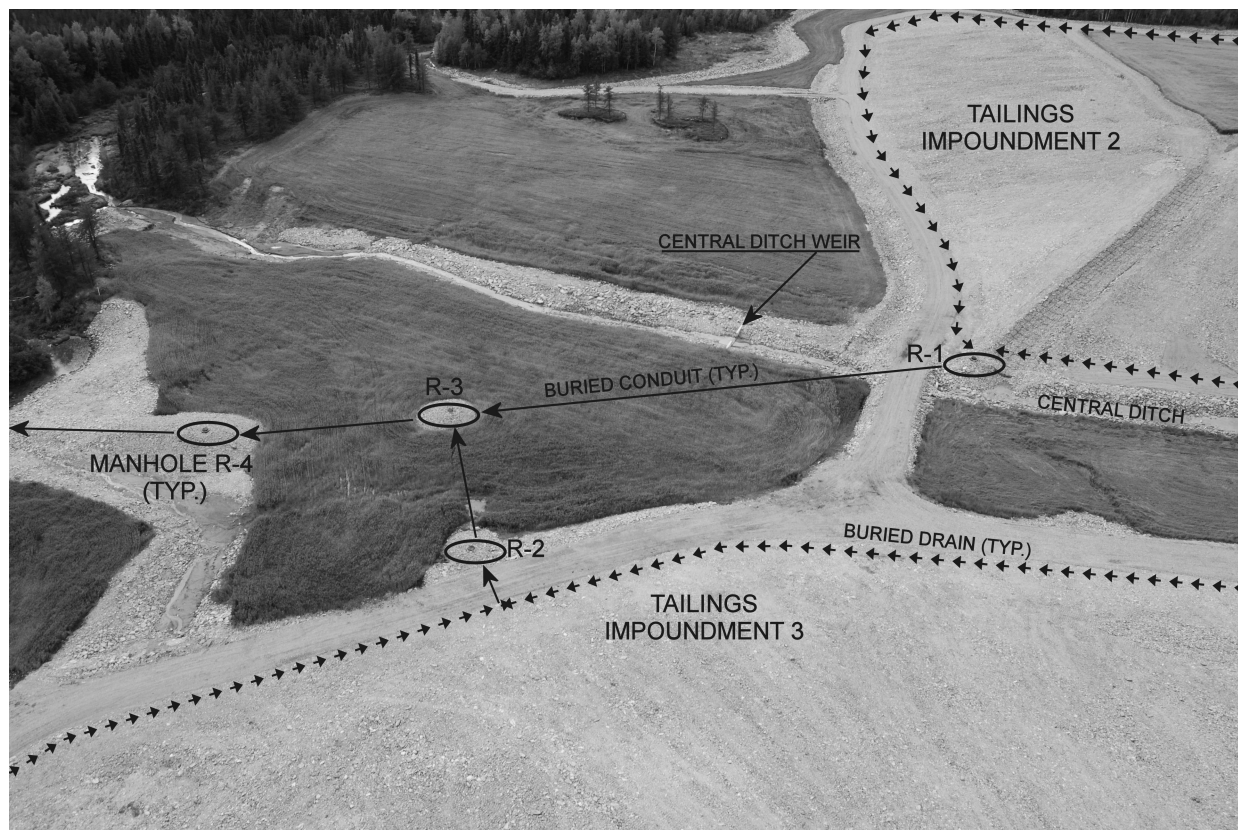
Aerial view to the south of manholes and location of seepage collector drains.
